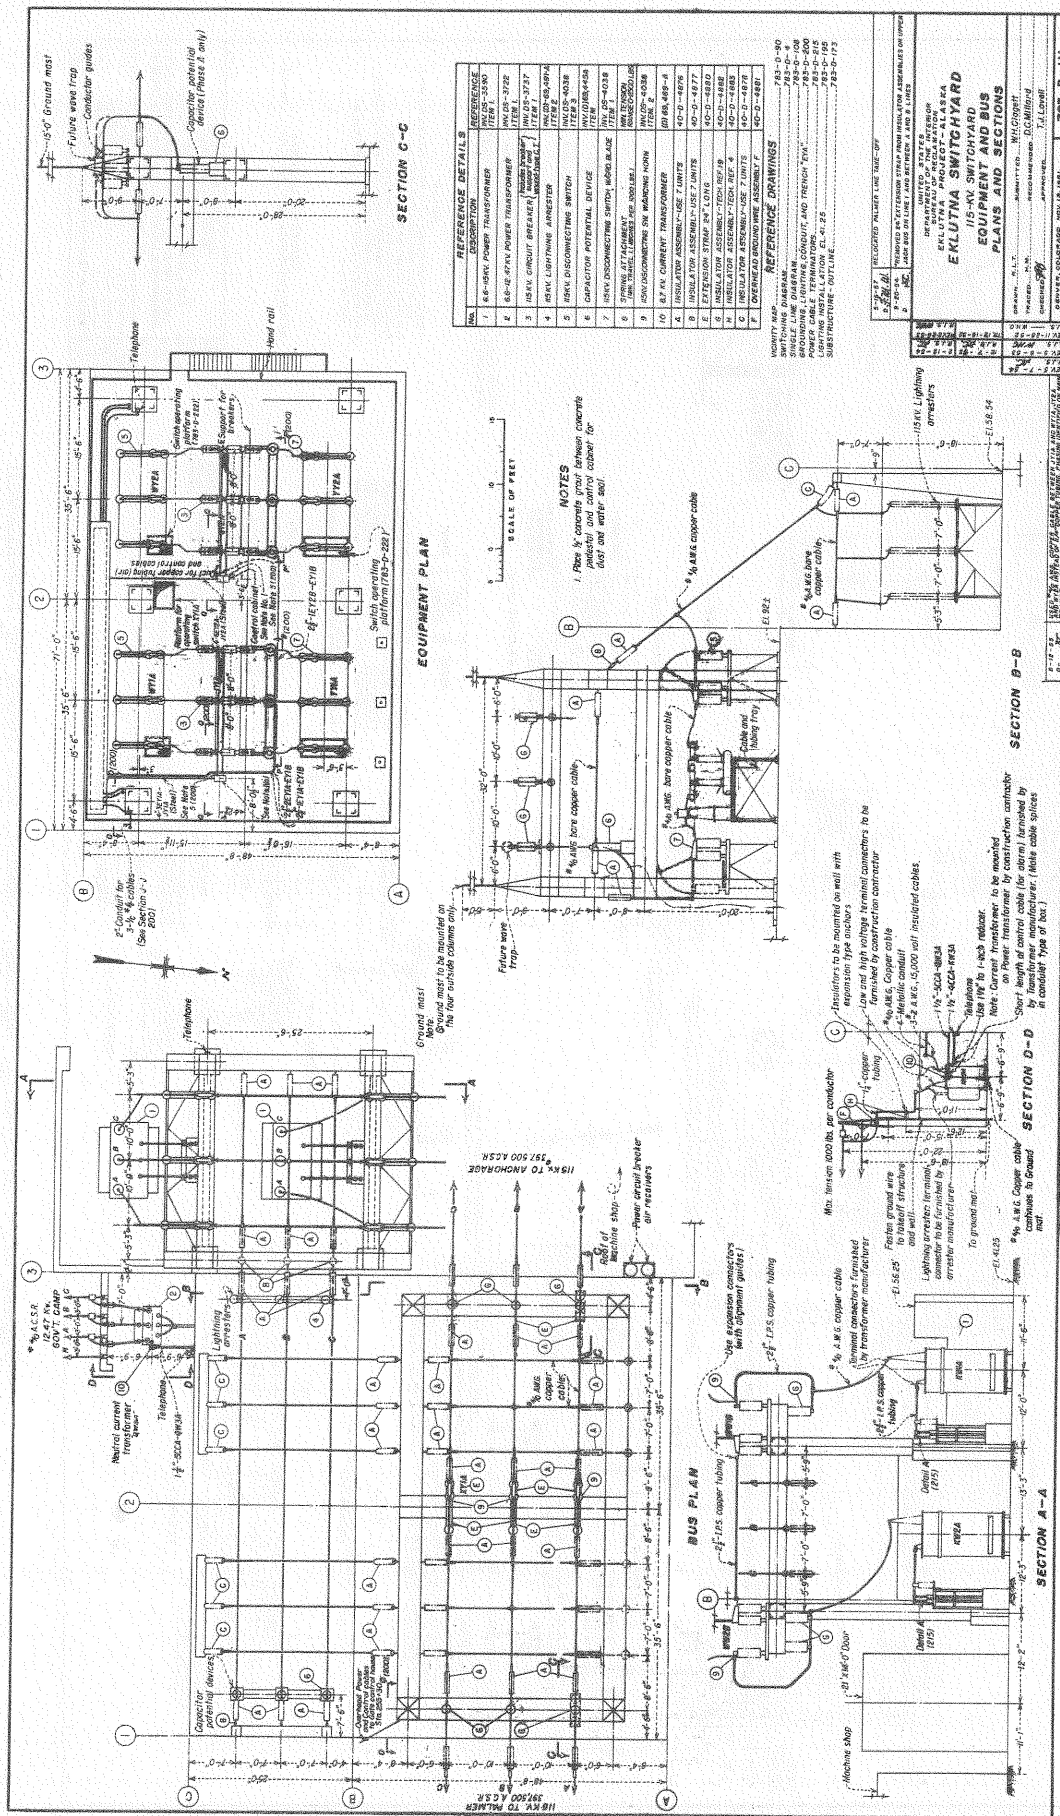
115-kilovolt switchyard equipment and bus--Plan and sections.
